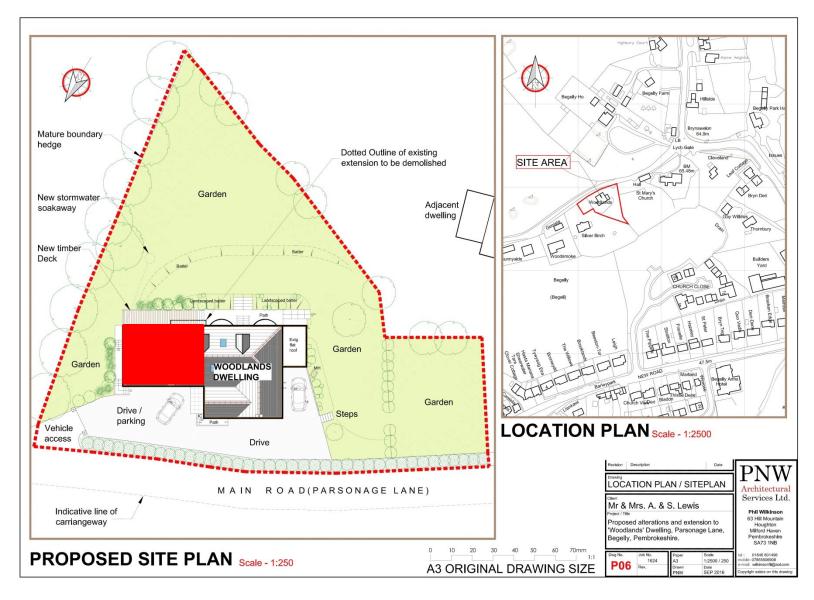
Location plan showing the proposed development (plan supplied by client) with new extension area highlighted in red Note that north is pointing roughly south-southwest on the main plan.
